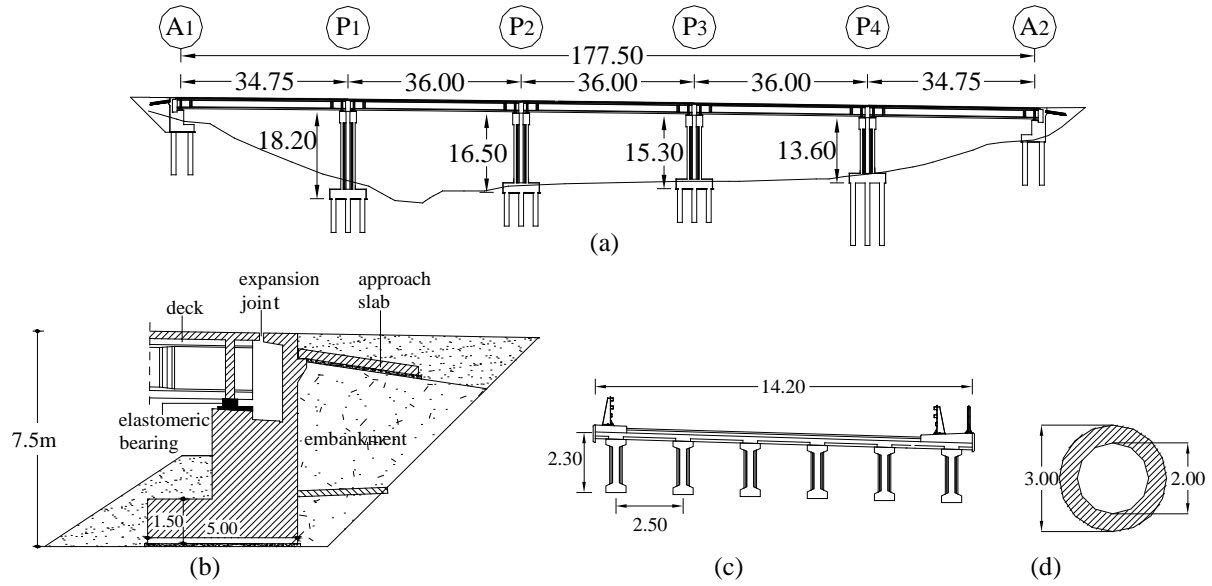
(a) Longitudinal section of the “reference” conventional bridge (b) Longitudinal section of the abutment (c) The cross-section of the deck at the mid-span. (c) The cross-section of the pier
